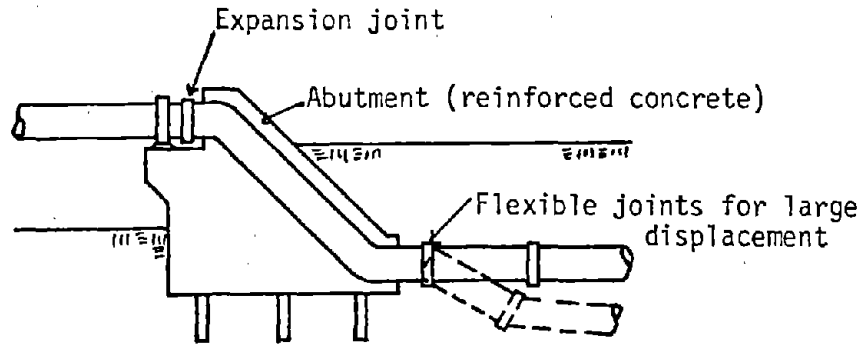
Attachment of pipes to abutments for pipe bridges (125)
